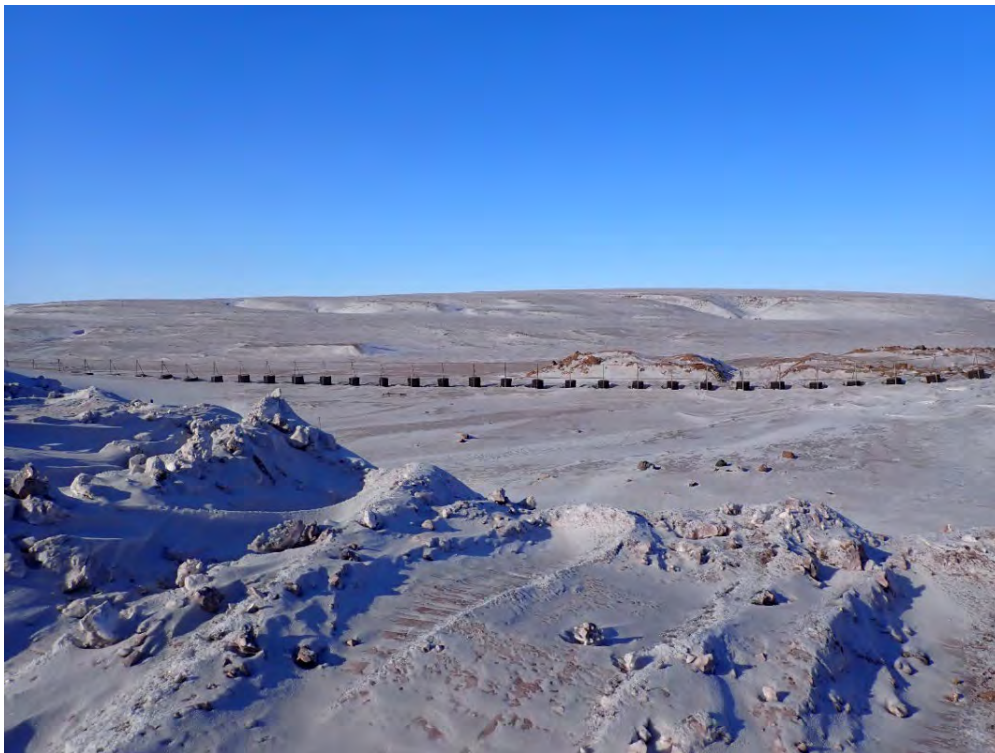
Aerial view of Emulsion Plant – September 2023
